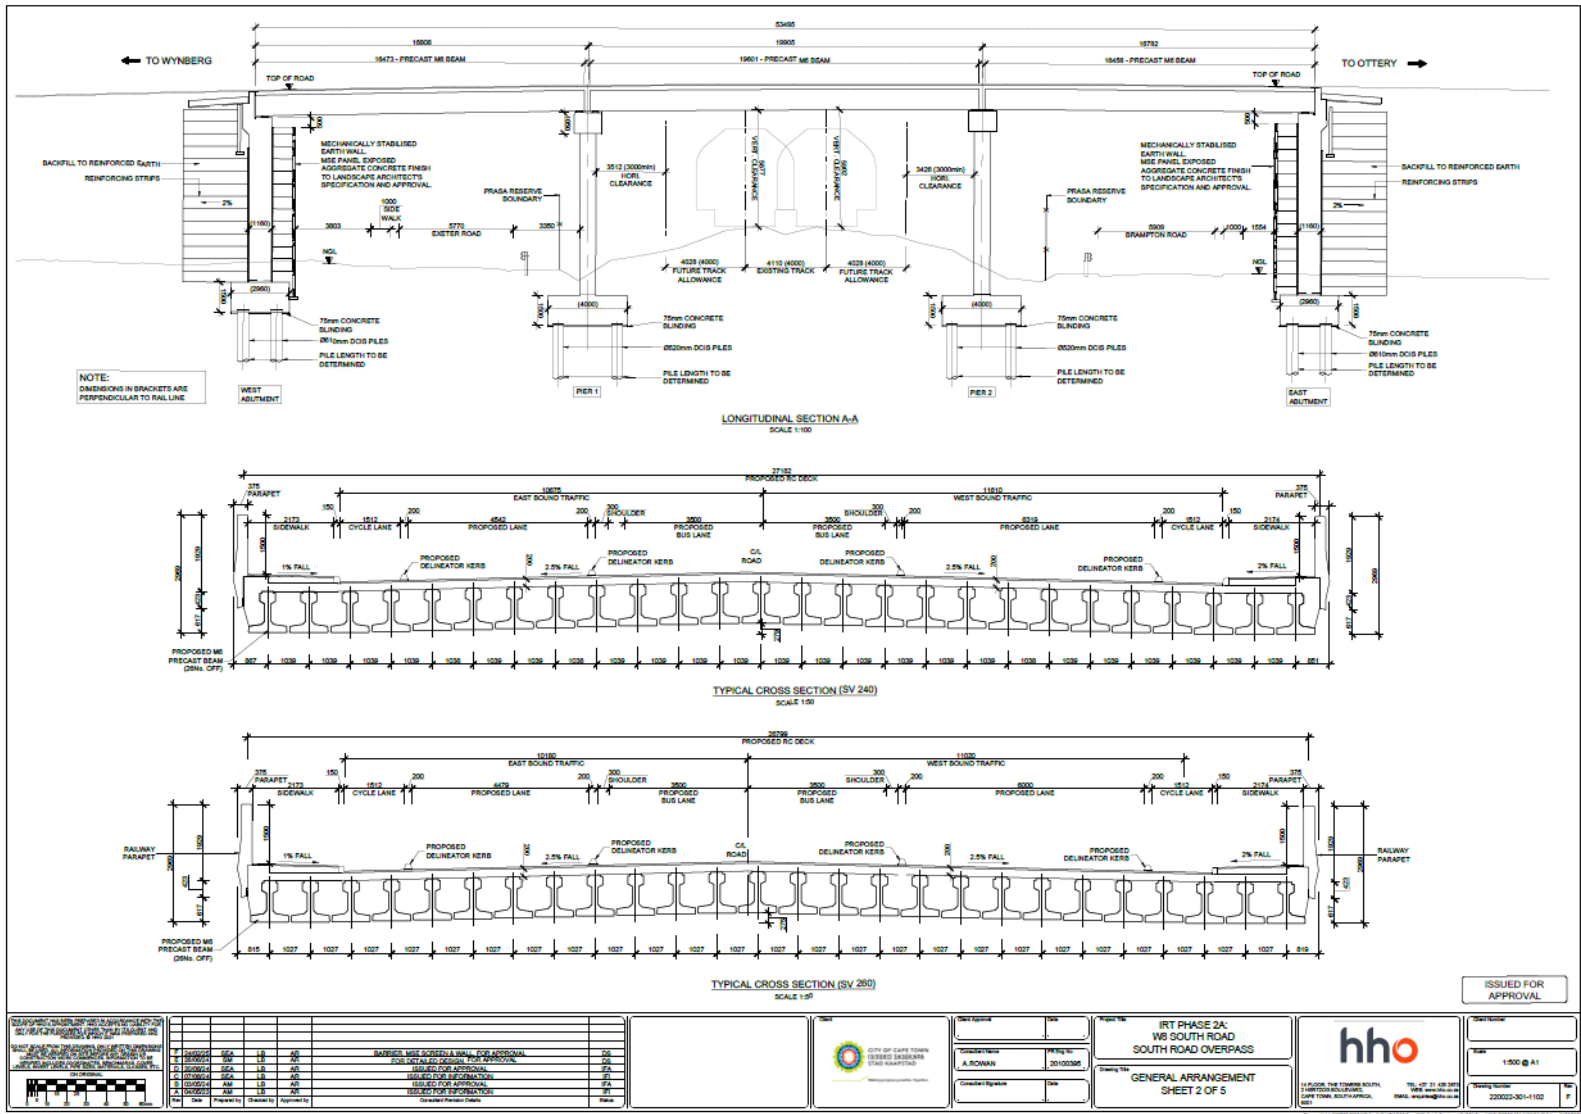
Typical cross section for bridge structure (rail overpass) (source: HHO, 2025)
